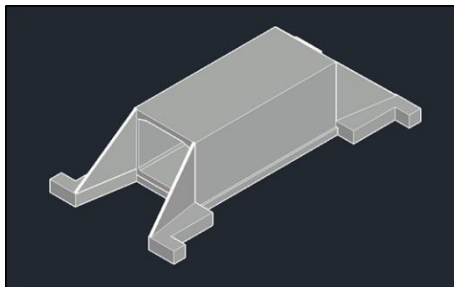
3D drawing of VBC CH377+430 by using AutoCAD
